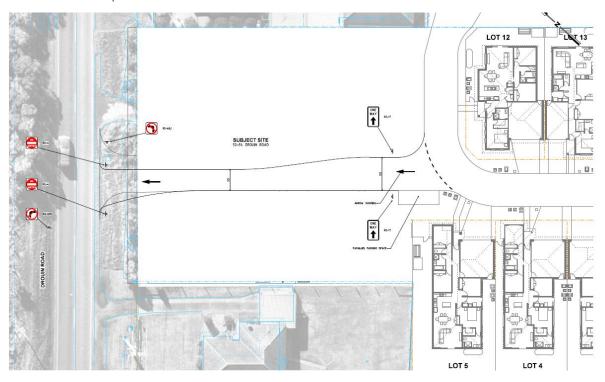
Proposed Concept Plan prepared by Onemilegrid
